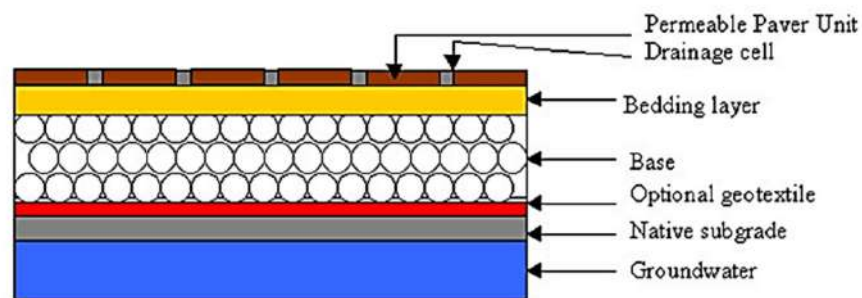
6: Sectional view of permeable concrete blocks paving stone pavement (James & Von Langsdorff, 2003)
